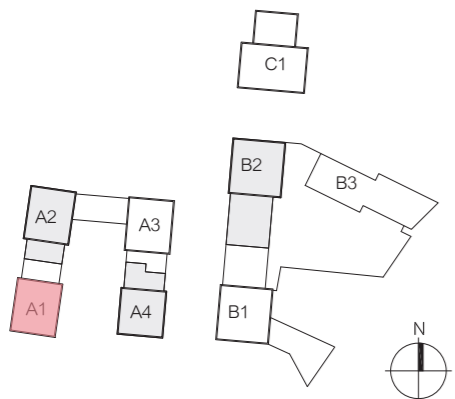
BUILDING A1 DESIGN ASSESSMENT
